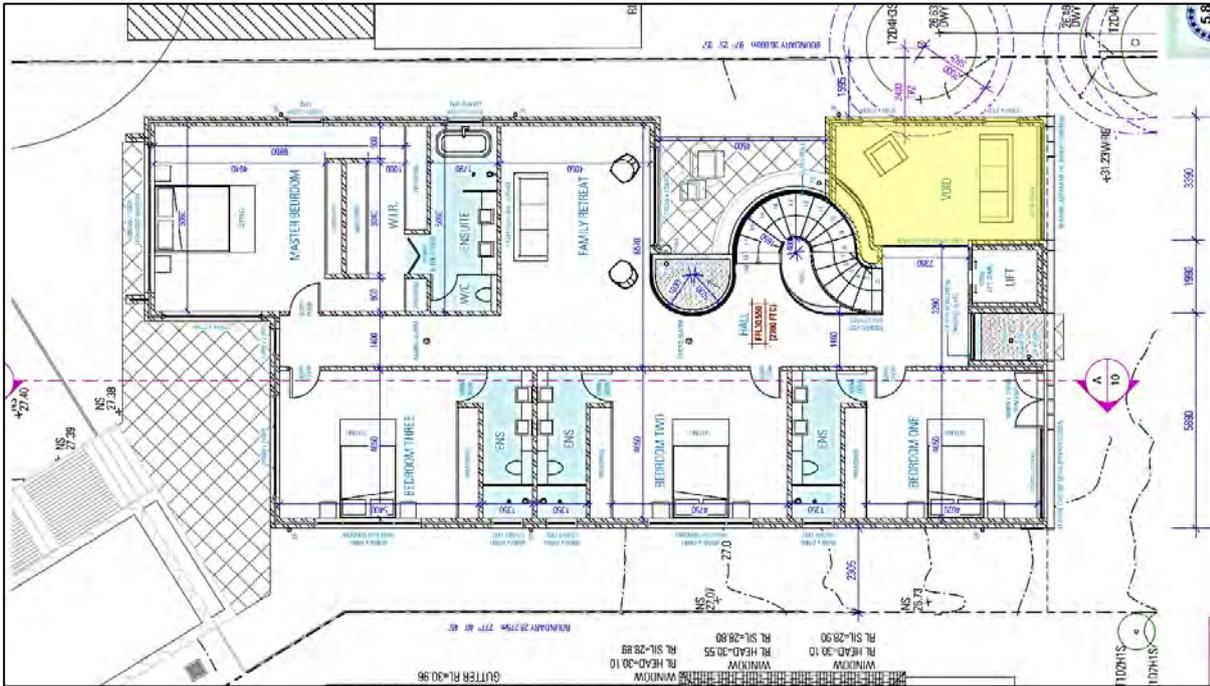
First Floor plan showing location of void (highlighted in yellow)
